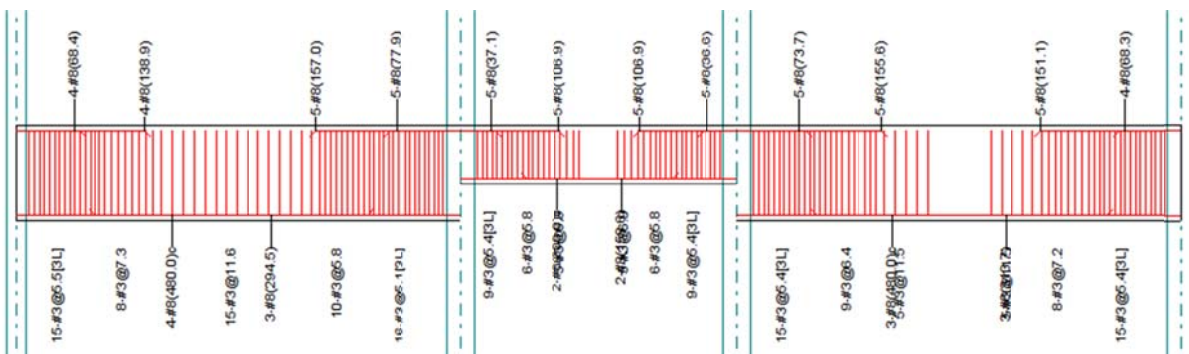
spBeam Column Line E Reinforcing Diagram (Lateral Loads)
